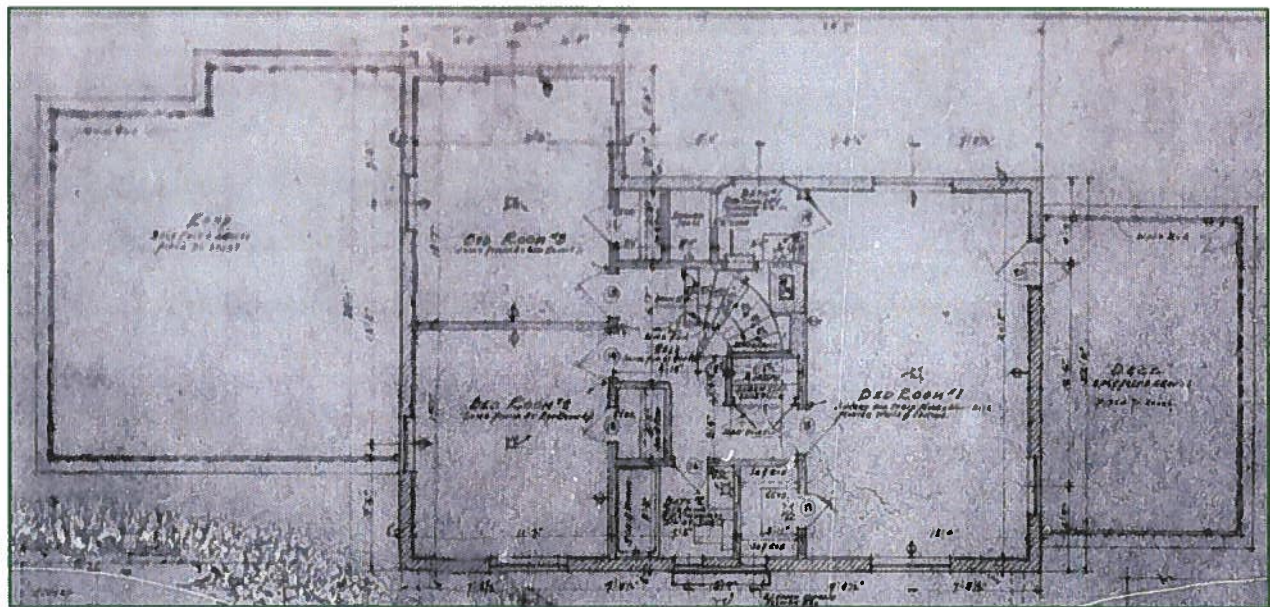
Permit 6225, 1940, Second Story Floor Plan
